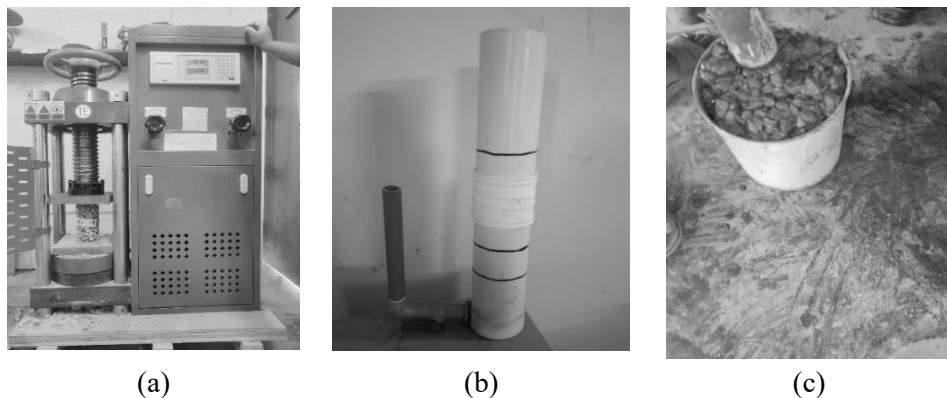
a) compressive testing machine, b) permeability test setup and c) apparatus of density and porosity
